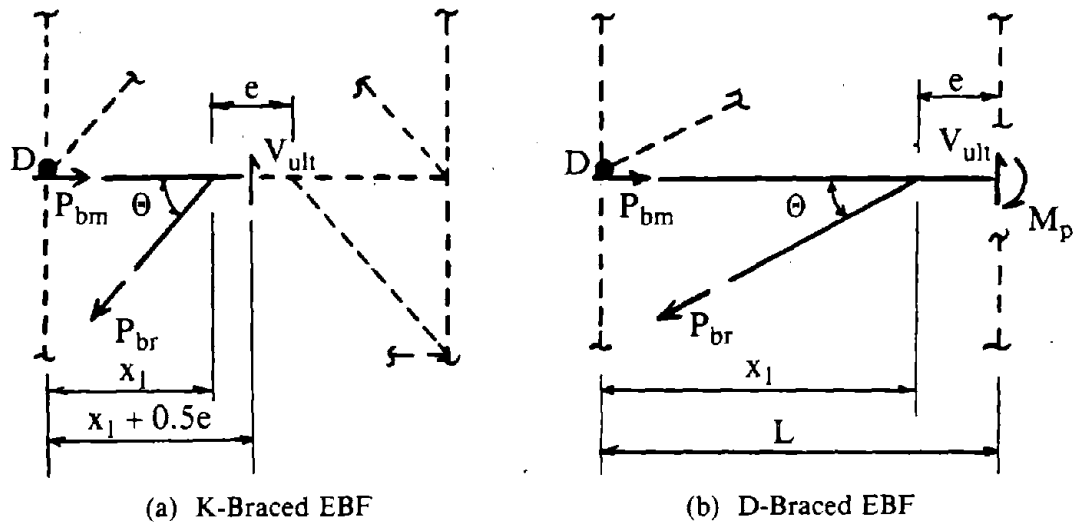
Beam-Brace Subassemblies to Determine Axial Forces in Brace and Floor Beam.
